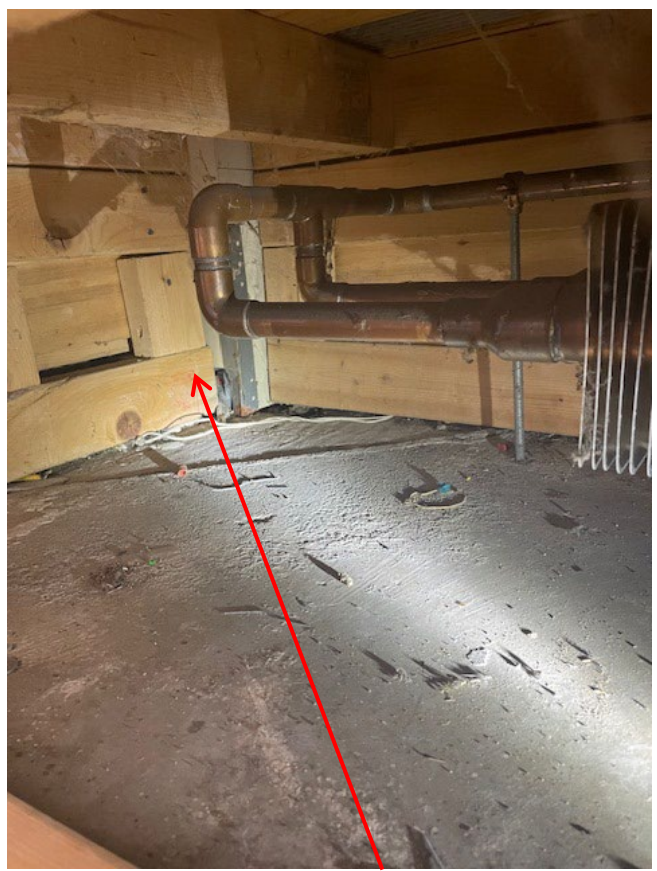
View of Classroom 240 under perimeter bench top at heat piping/radiation unit with bare concrete floor. Wood support joists dry with no visible mold. Suspect mold growth on underside of bench top (not pictured).
